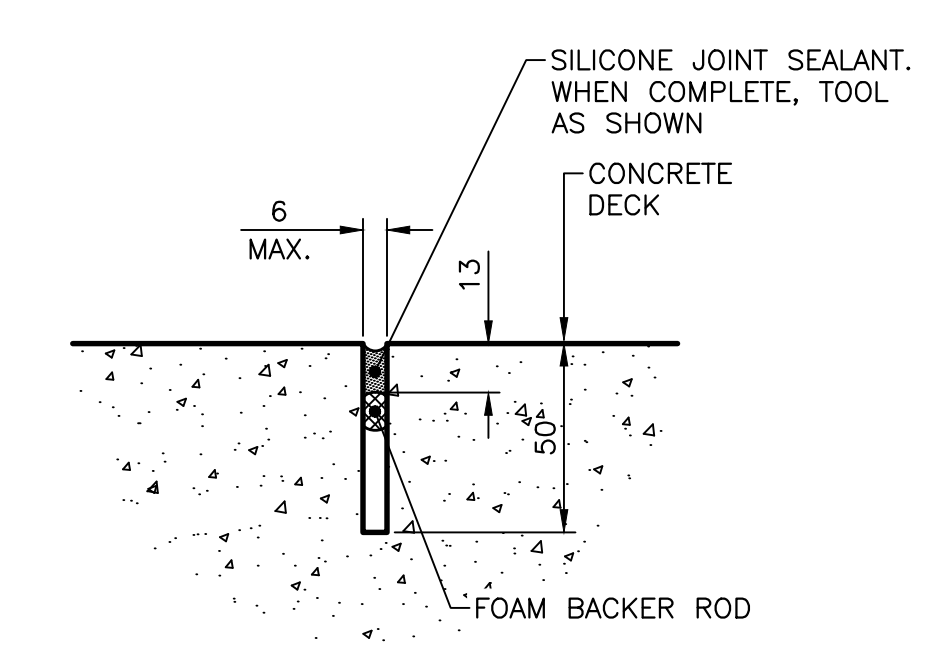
DETAIL OF PRECAST CONCRETE SLAB 32
